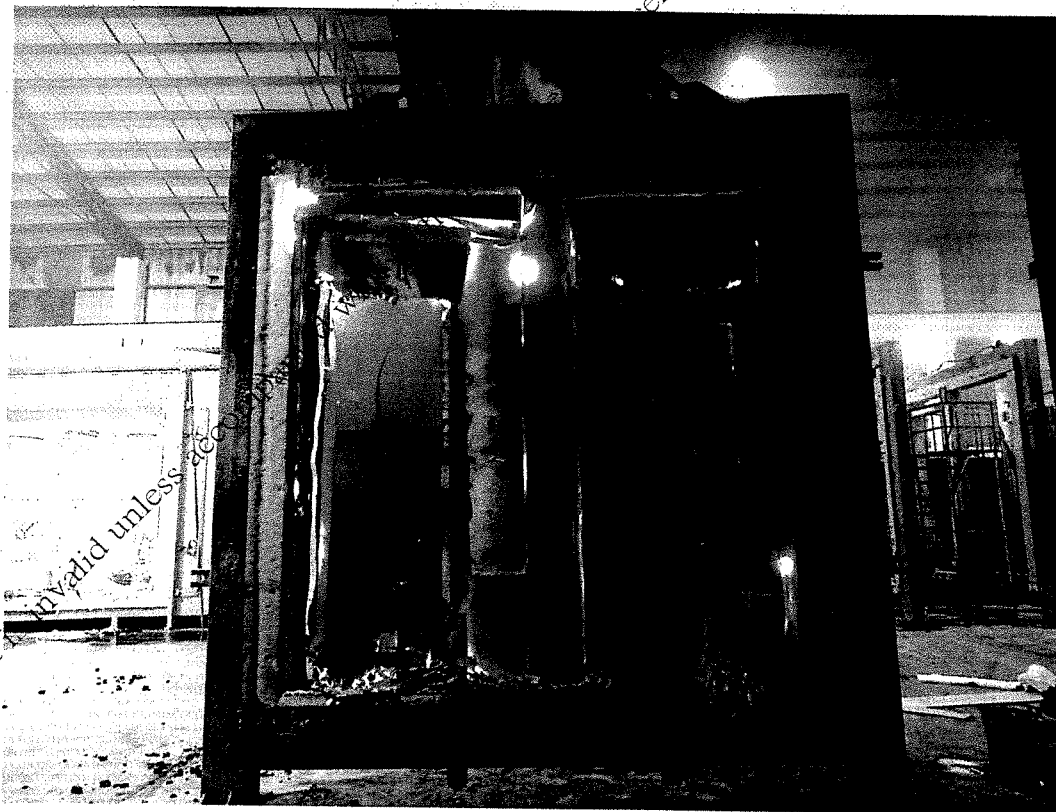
Exposed surface of the specimens at after test. (Left: Door B; Right: Door A)
